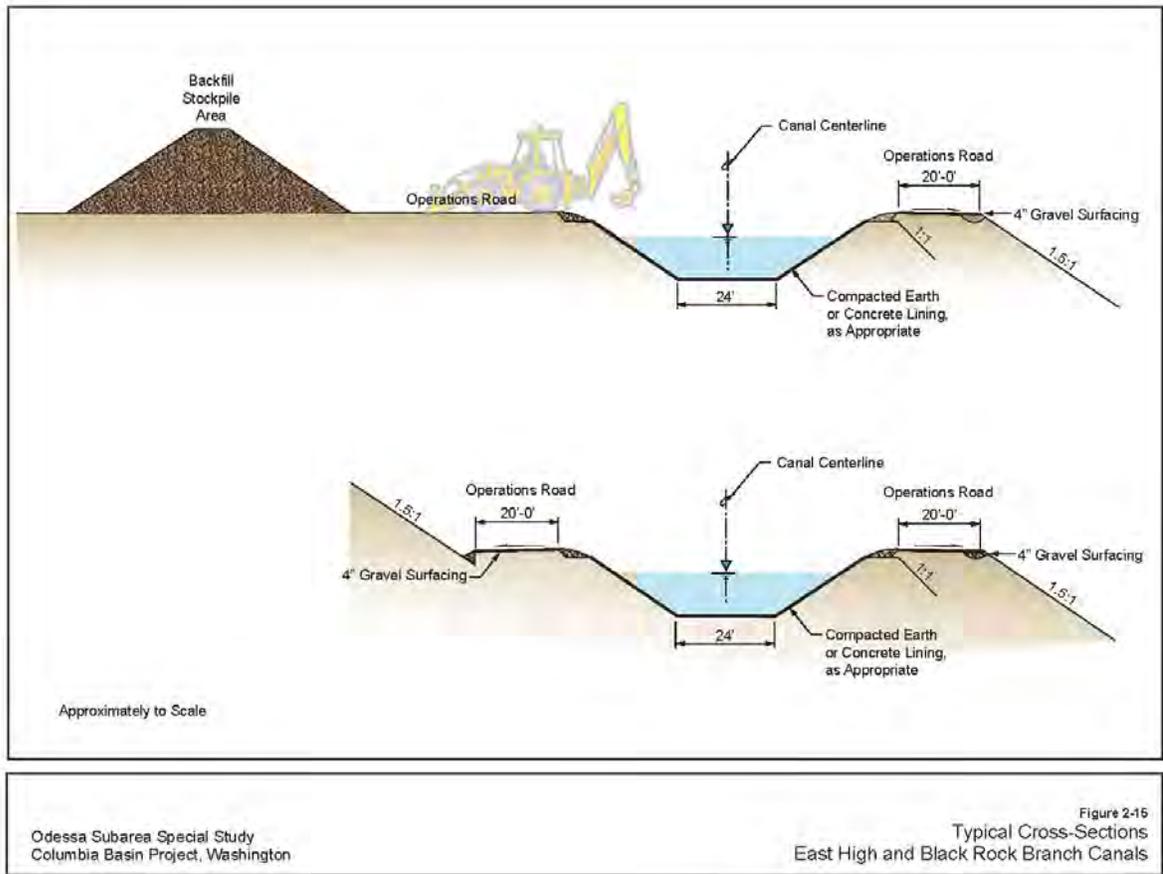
24. Typical cross section East High and Black Rock Branch canals
